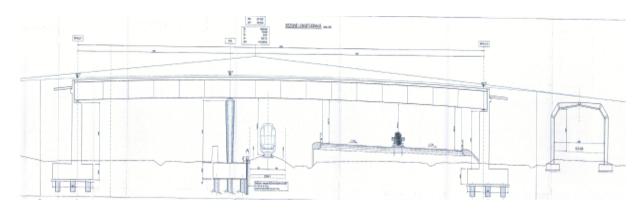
Longitudinal section of the bridge Source: steel workshop tables
